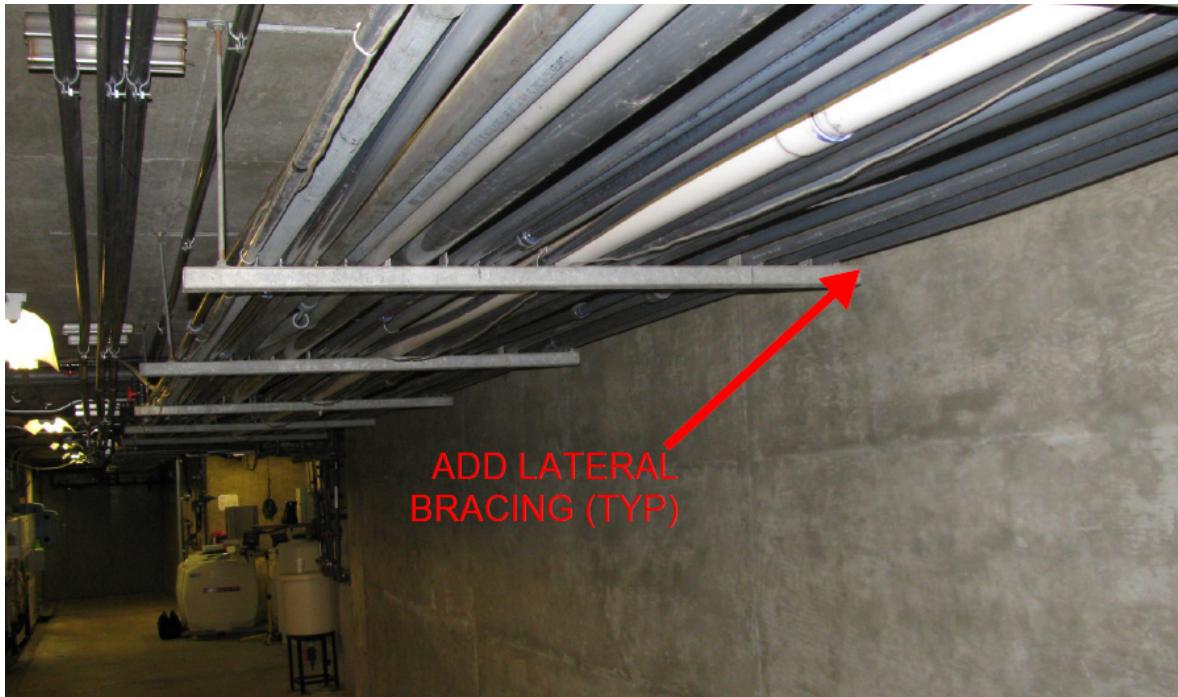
Conduit supported from the pipe gallery tunnel south of the Flocculation Basins lacks lateral bracing against seismic loads.
